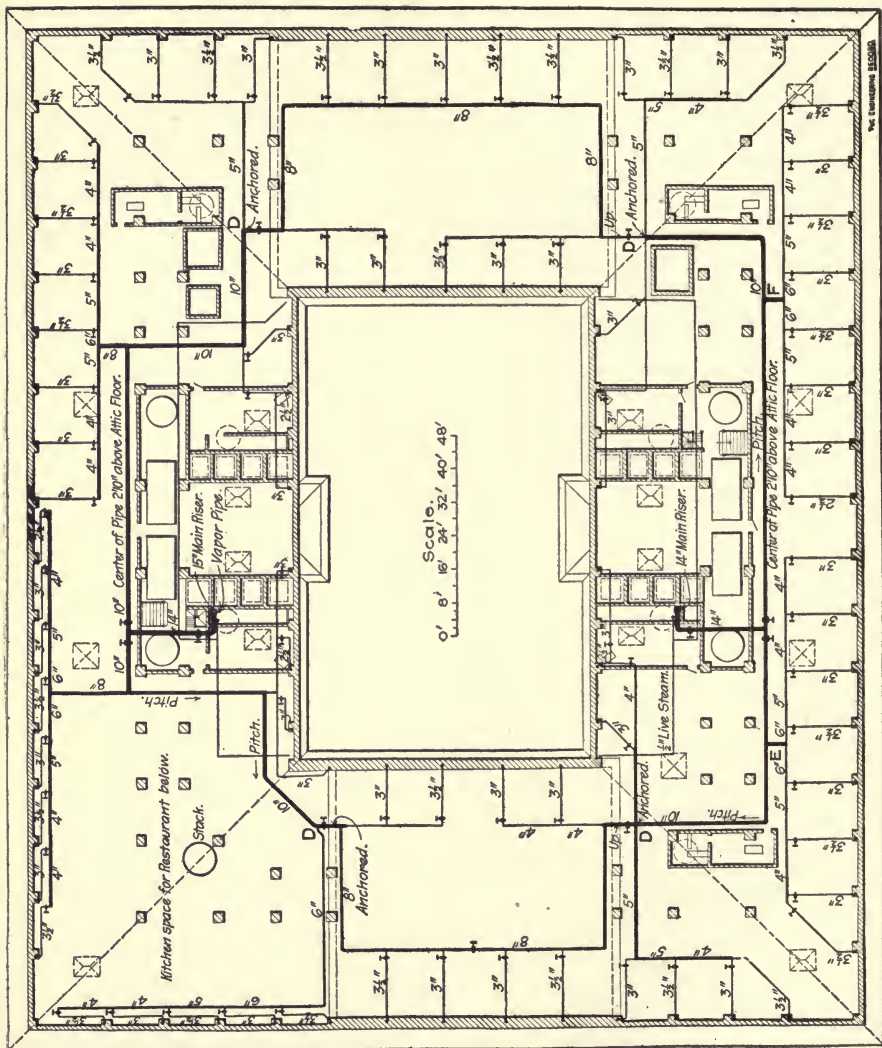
Piping in Attic of Ellicott Square Building, Buffalo.
